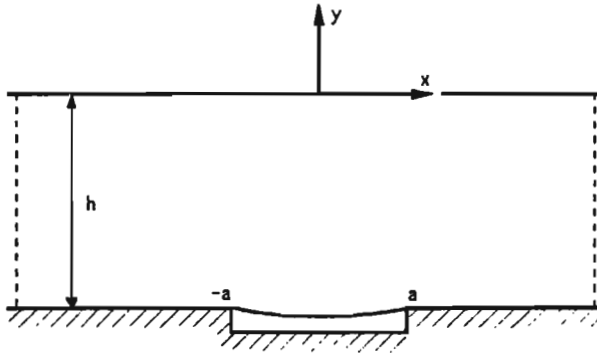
The middle-cross section of the stratum resting on the foundation with excavation
